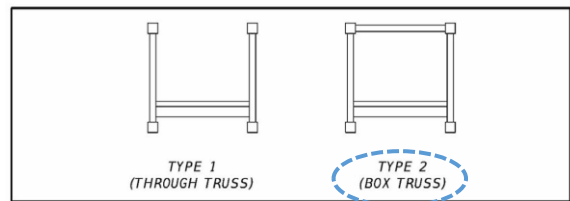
Prefabricated Pedestrian Bridge Standard Truss Member Shapes
